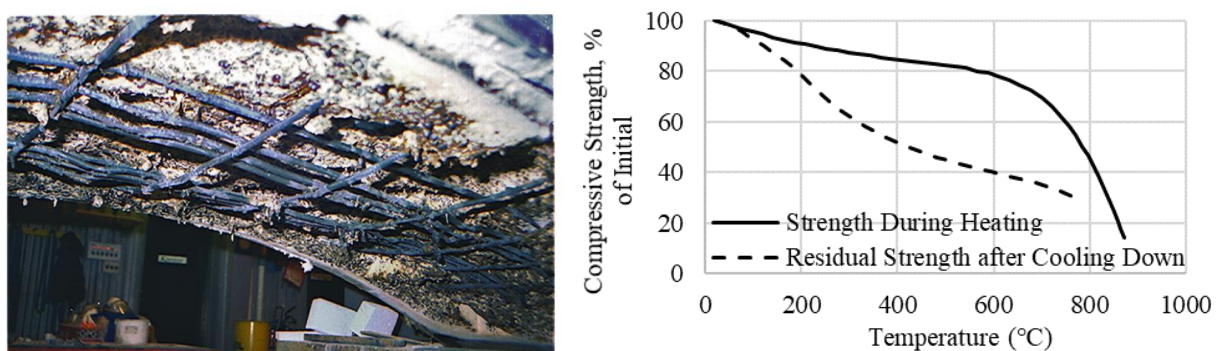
Typical concrete damage after heat exposure: spalling (Jansson 2013) (left) and strength reduction (ACI 14) (right)
